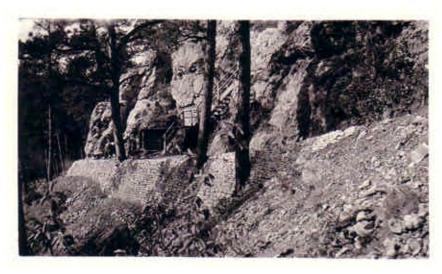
Path to Cave Entrance under Construction, ca.1935 (Source: JECA 2794)
